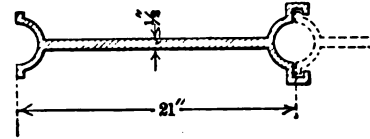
MATTHEWS' CAST-IRON SHEET-PILING.
